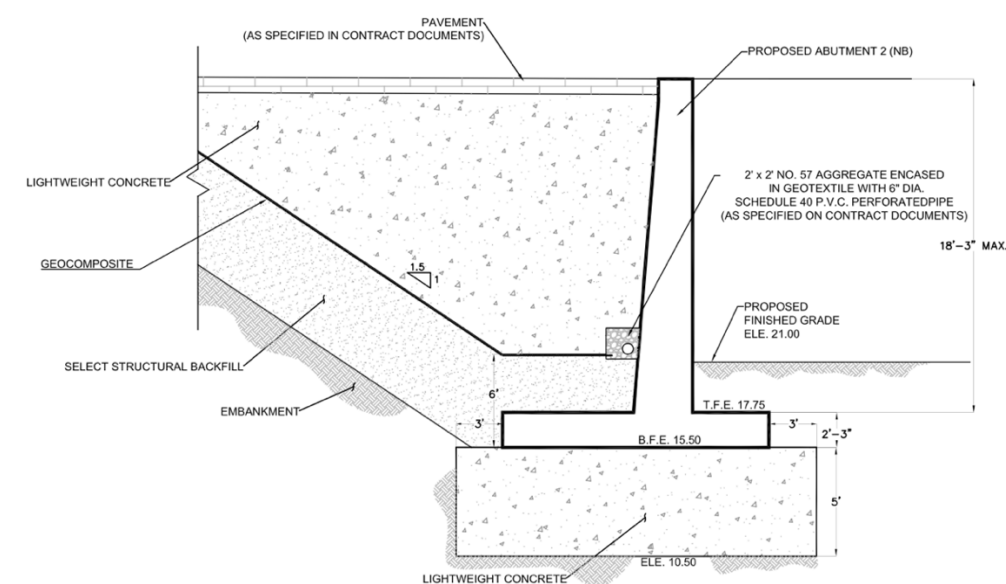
Typical cross section for Abutment 2 (NB) (0095 Over Shackamaxon Street, S-26064).
